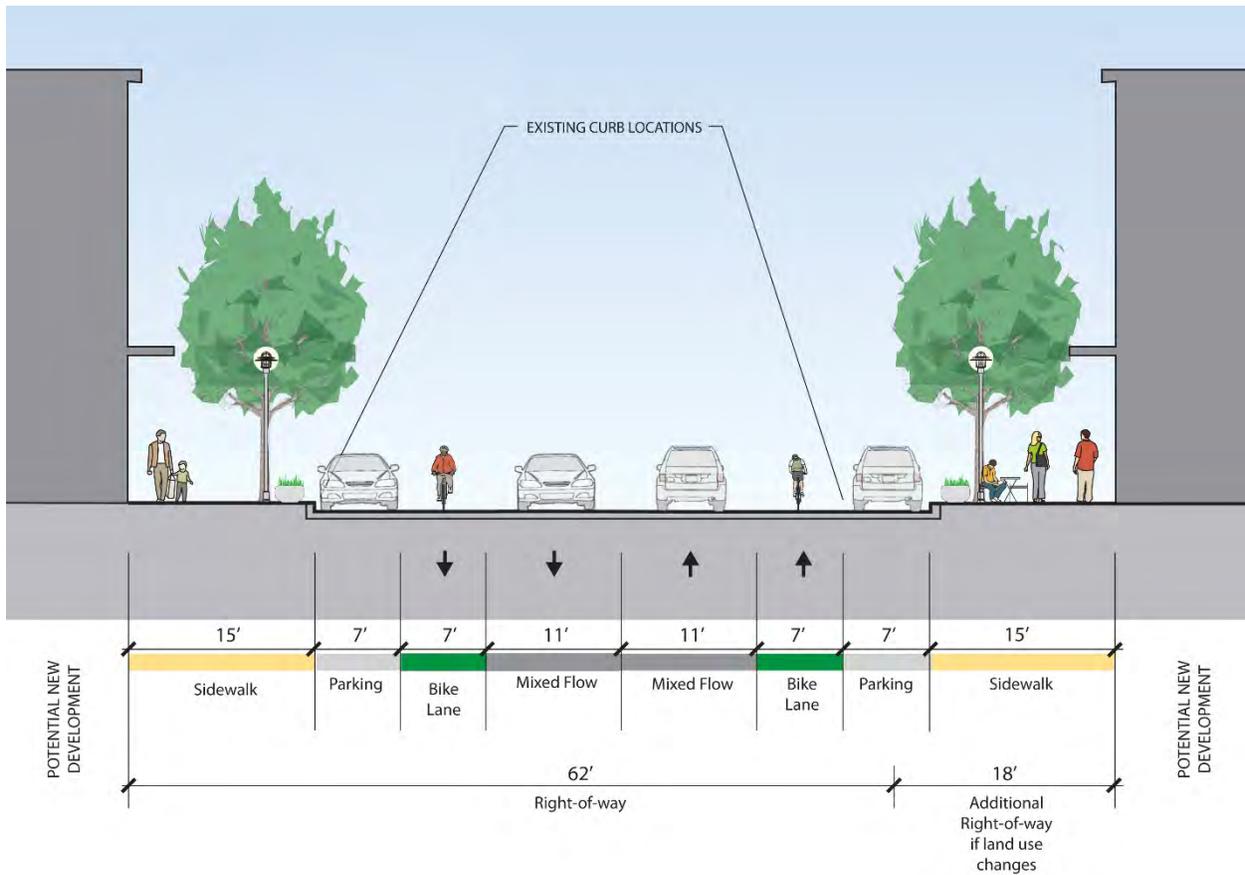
Street Section - Center Street at Hatch Park (looking west)
